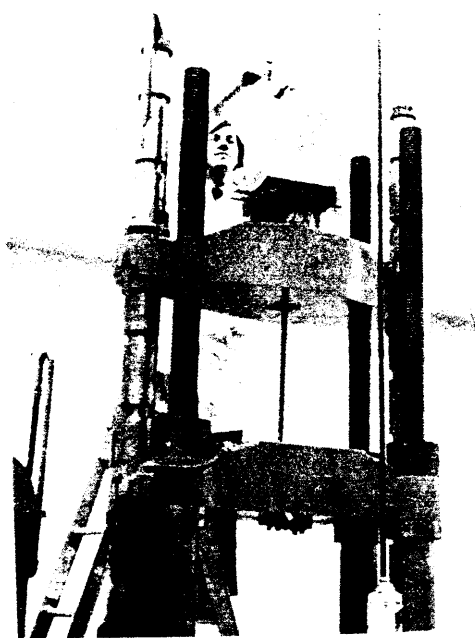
Pullout Specimen on Electromechanical Testing Machine Being Prepared for Testing
